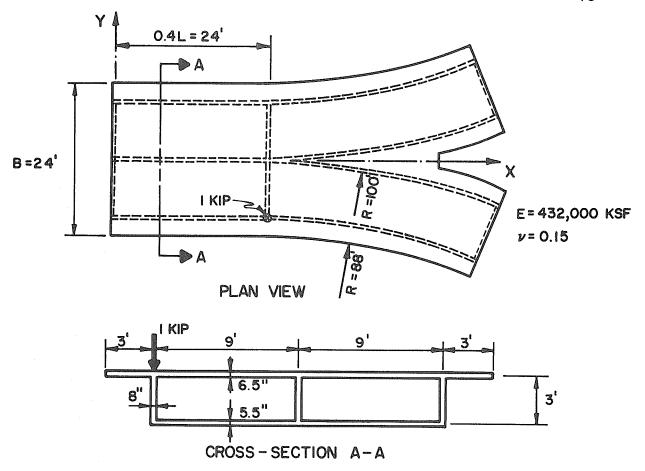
EXAMPLE 6 - TWO CELL HIGHWAY BOX GIRDER BRANCH
